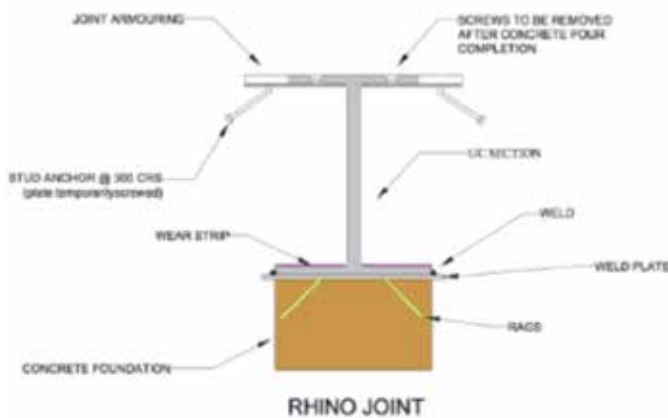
The NZ designed “Rhino Joint” is a patented movement joint system that prevents slab curl by restricting upwards movement.
